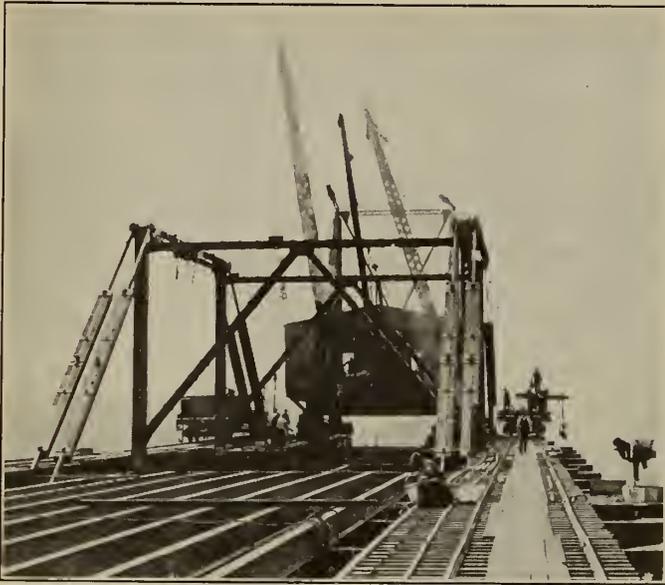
South Approach—Cantilever Erection of 245-foot Spans—Details of Harness.
